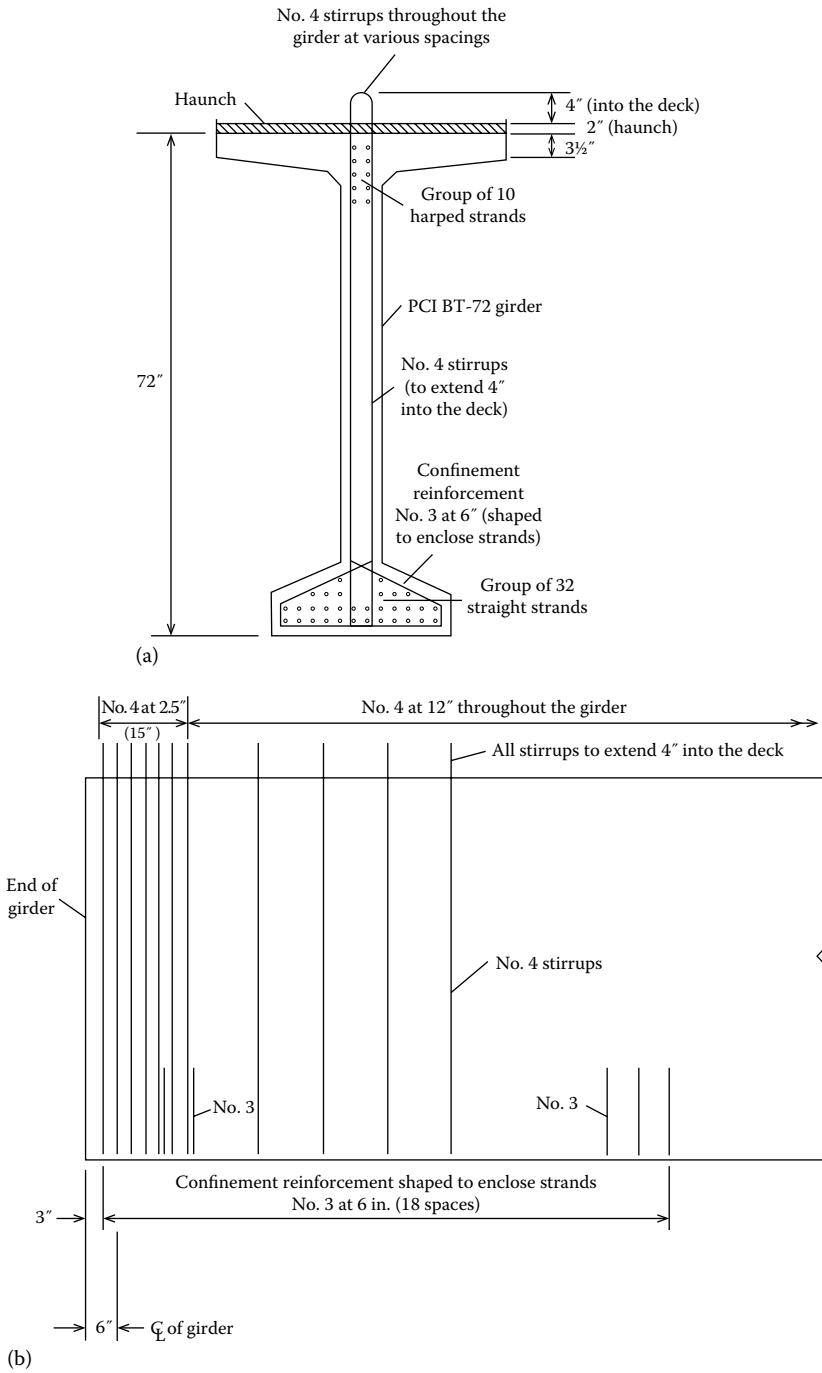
Details for reinforcement in the end region of the girder. (a) Girder cross section of BT-72 and (b) elevation of the girder.
